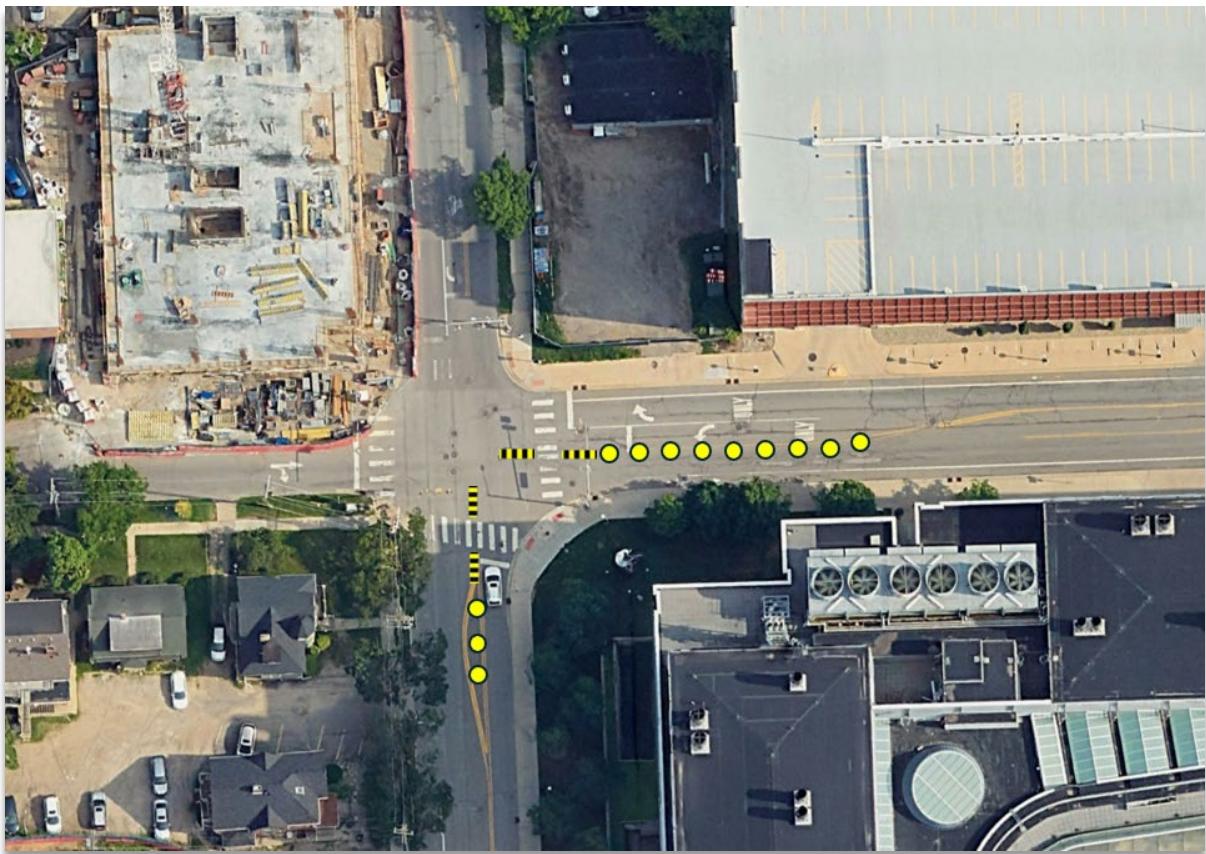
Recommended Placement of Centerline Hardening at Ann Street and Glen Avenue
